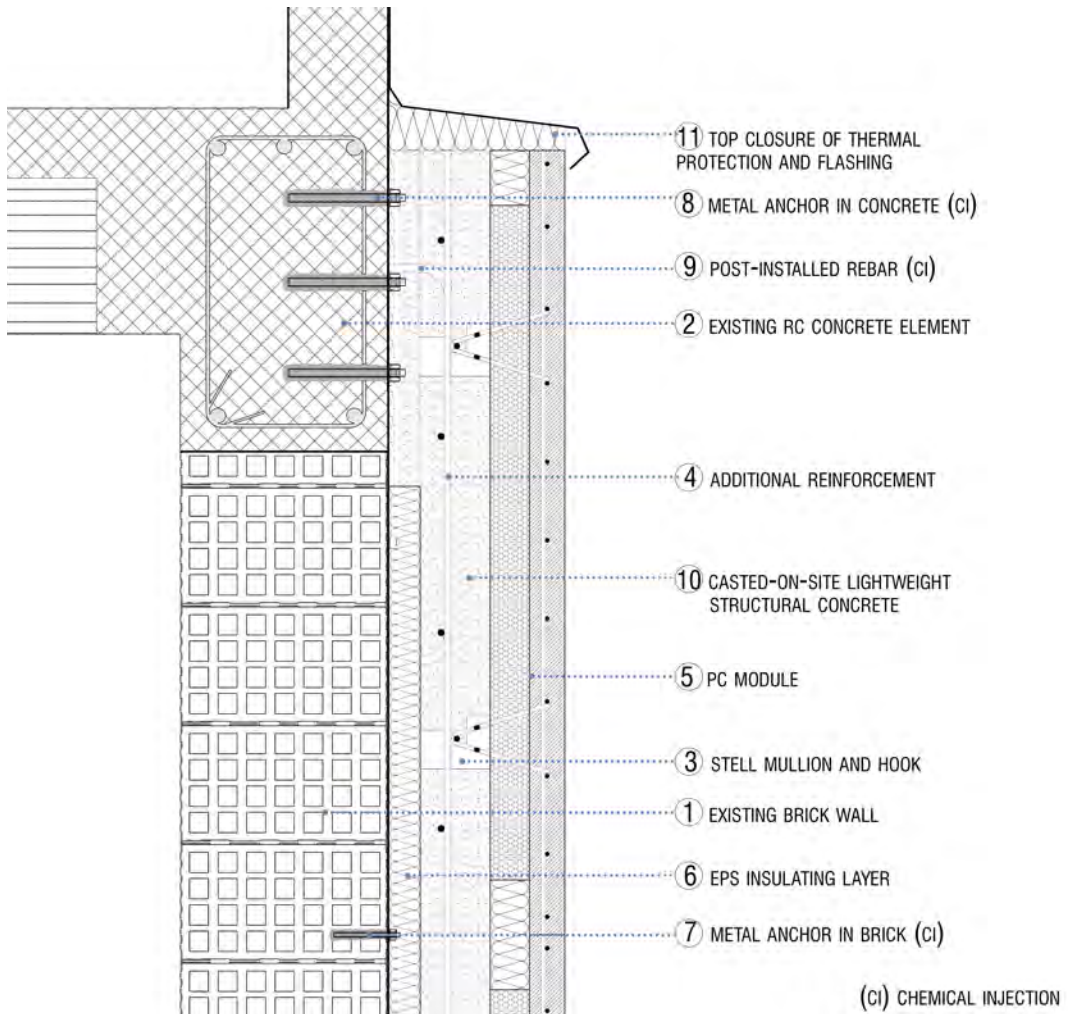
Vertical section: top ending. Source: Author
